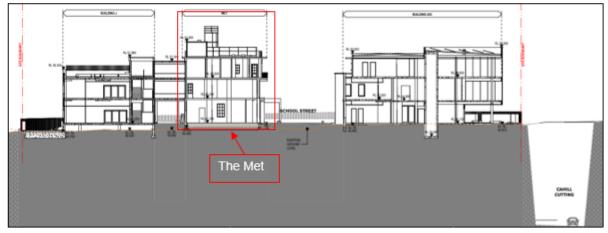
| East-west section (Source: Applicant's RtS 2020)
